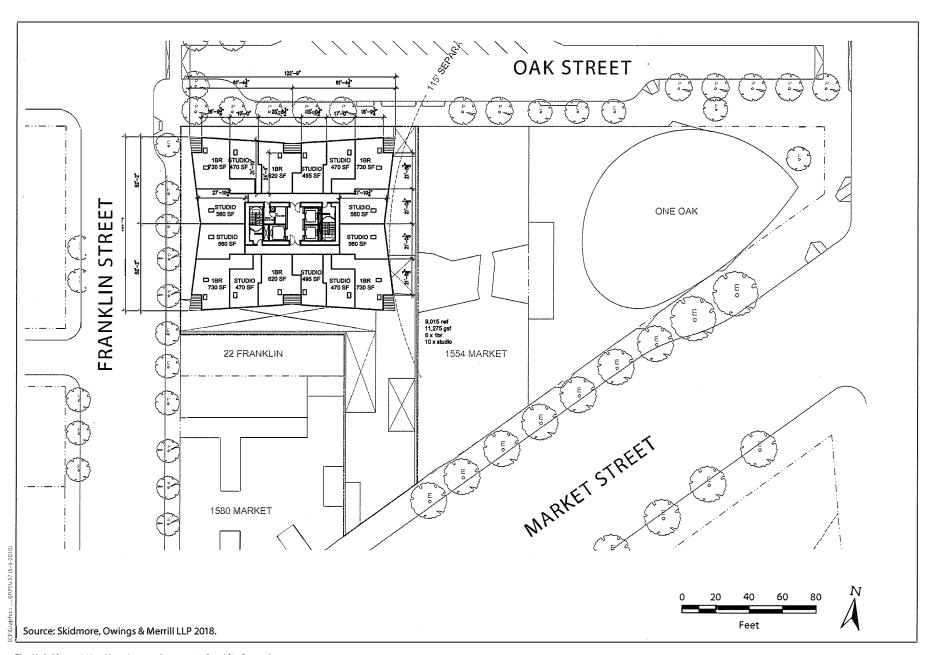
98 Franklin Street Project – Proposed Lower Tower Floor Plan
